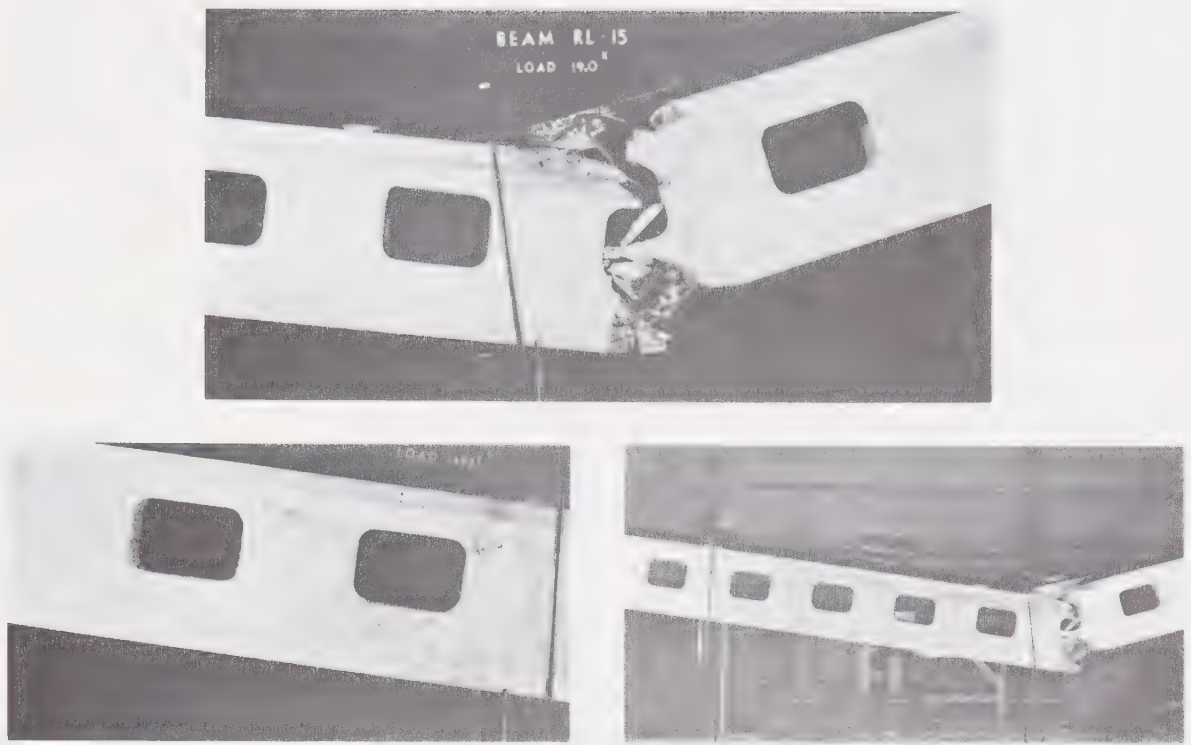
CRACKING AND FAILURE PATTERN OF BEAM 15-12-6
